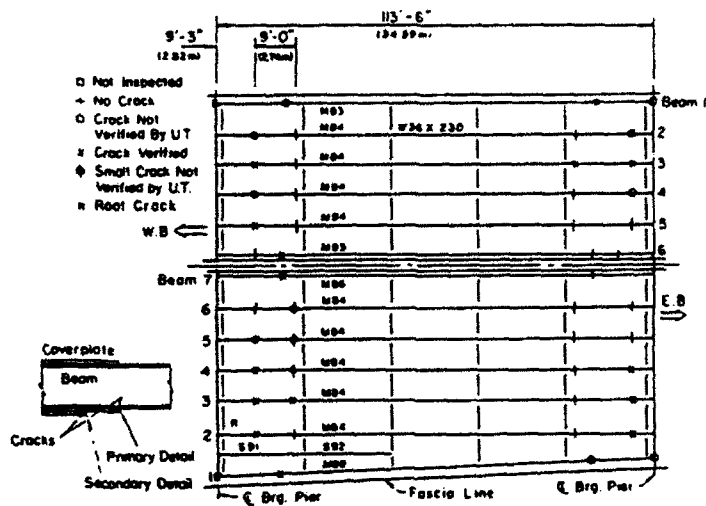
Plan of span 10, Yellow Mill Pond Bridge.
